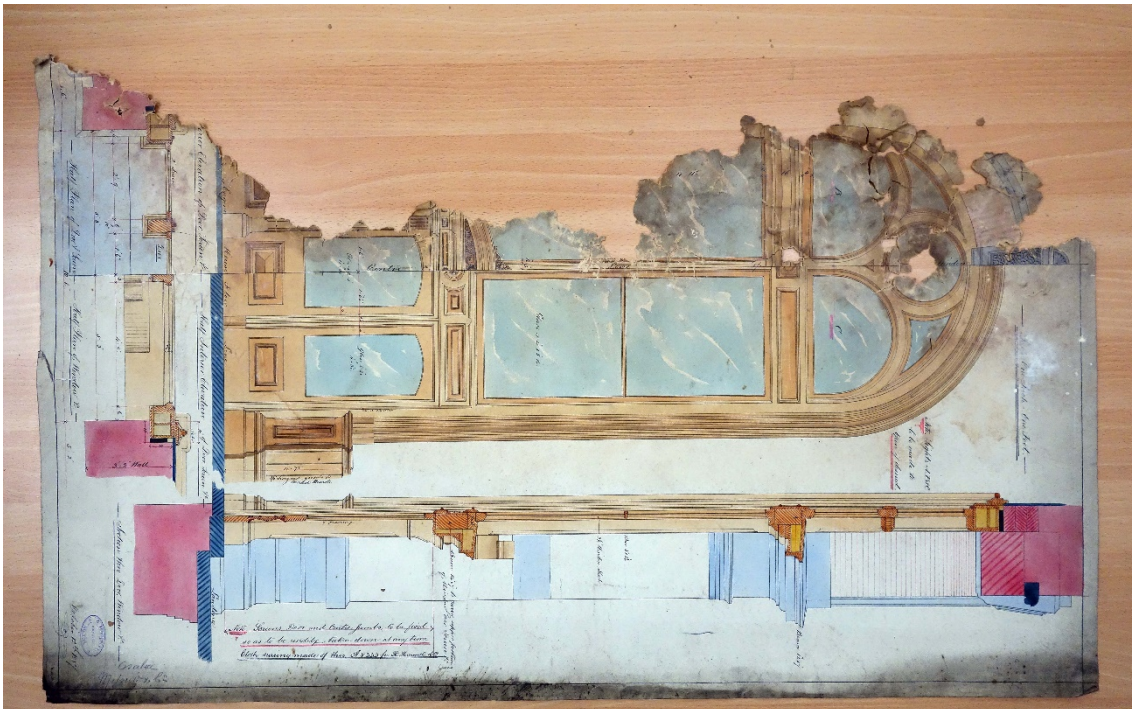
Engine house window detail, Mill No. 3 at Osaka Bōseki [1887/6]
